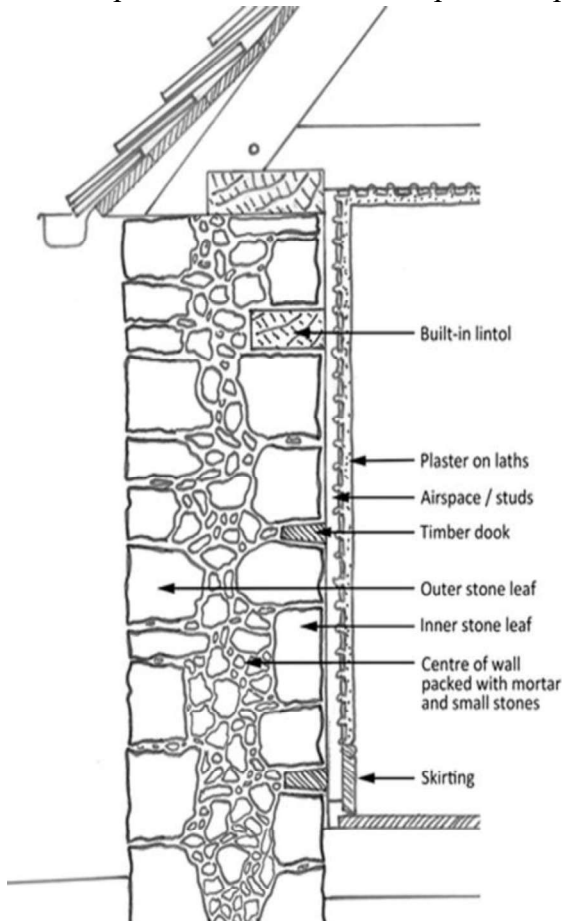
Stone wall section. Source: Baker P. (2011).
